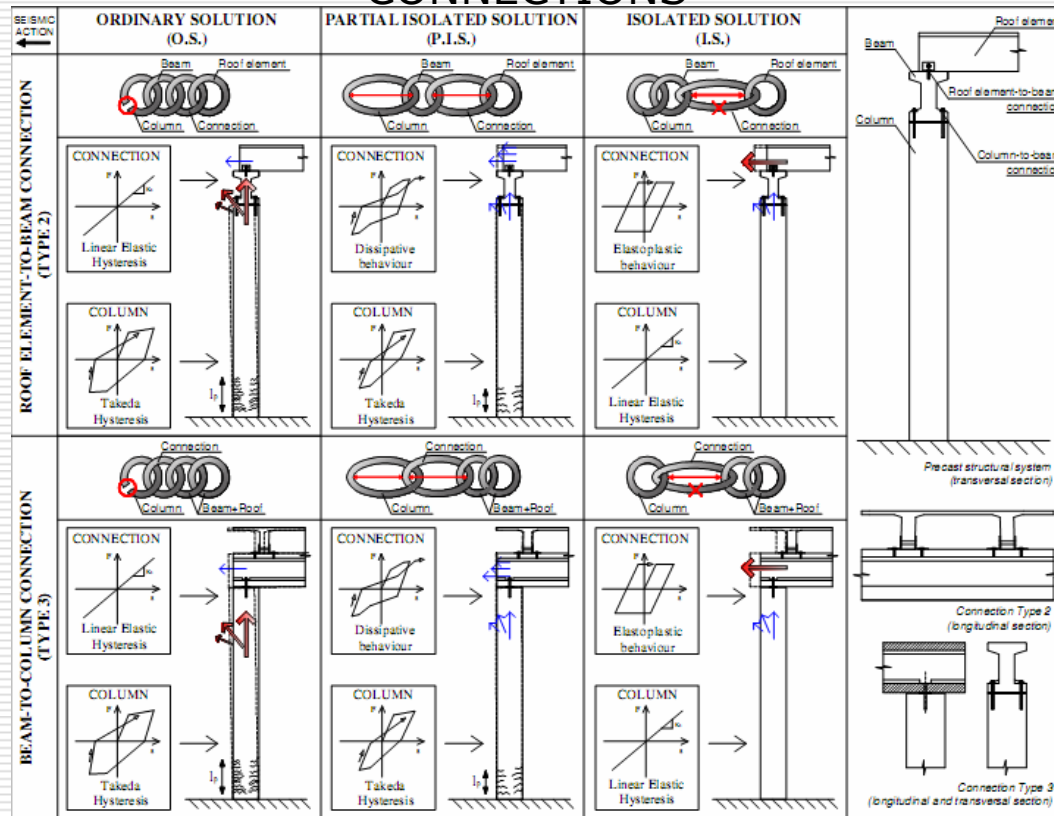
Different solutions of roof element-to-beam connections and beam-to-column connections
